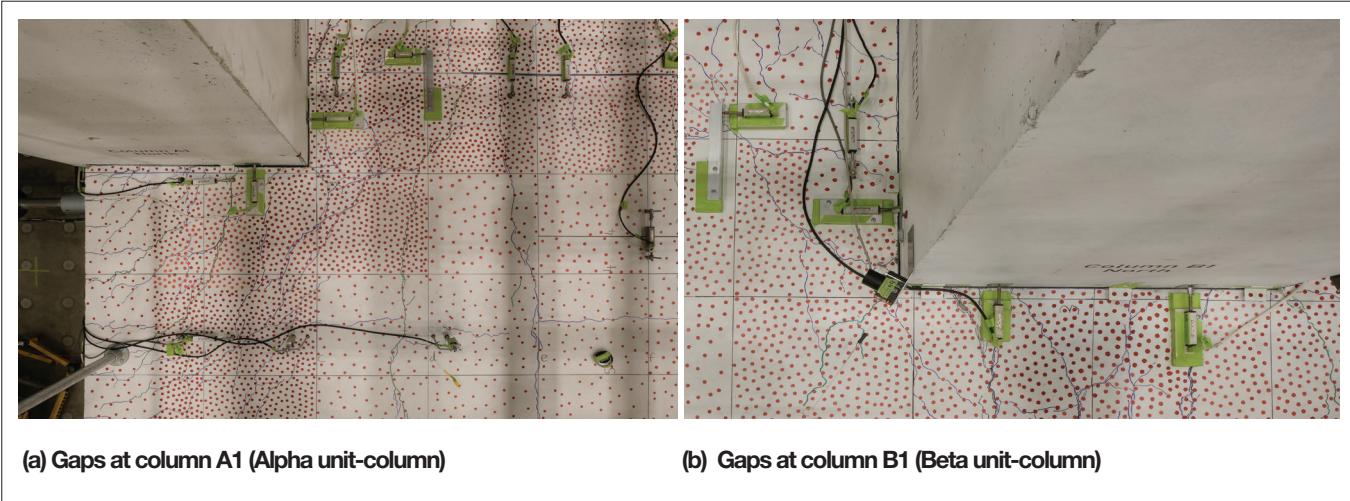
Gaps between the floor and columns at 1% drift in TEST 1
